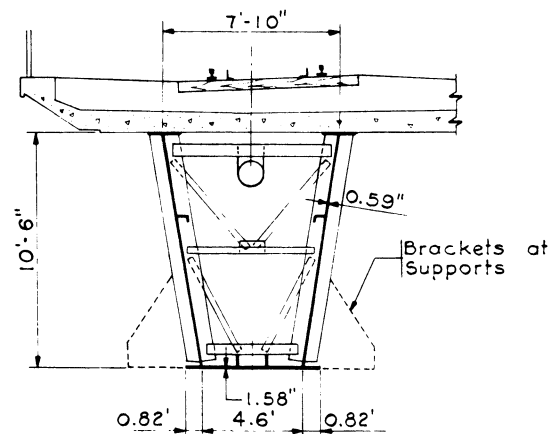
Standardized Czech railroad bridges. Span 152 ft-6 in. A single steel trapezoidal section with precast concrete deck. The deck is connected to the box by high strength bolts to achieve composite action. This standard section may be used for single and multi-track railway bridges
